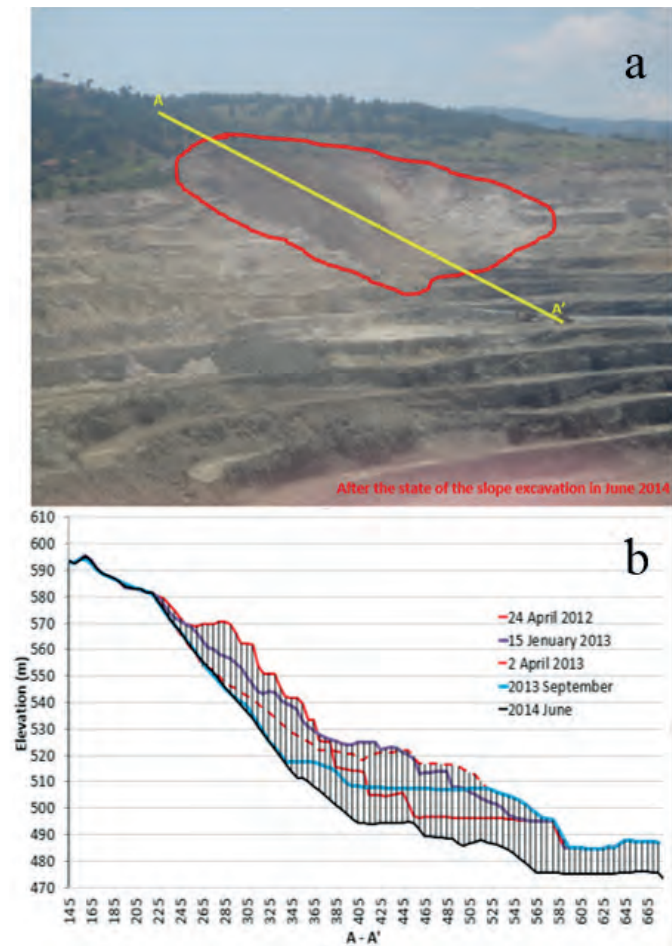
(a) After the state of the slope excavation in June 2014, (b) view of sections of slope failures happened in 2012 and 2013 and post-excavations.
